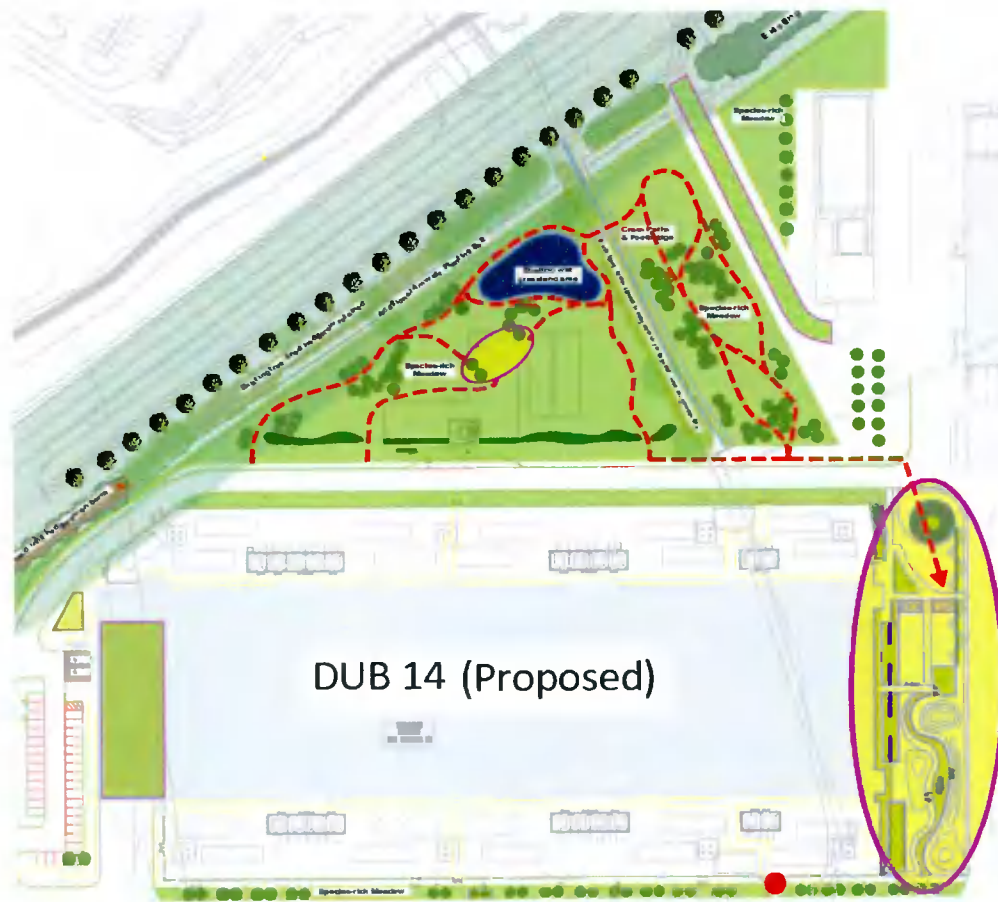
Extract from Site Masterplan north of CAB Building – Recreational Trail and Employee Garden
